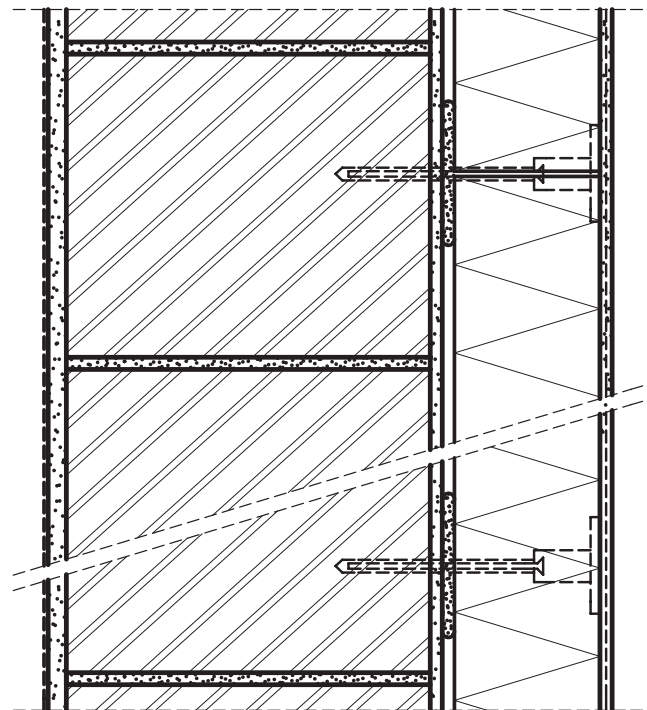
Example detail: an aerated clay masonry wall with an external thermal insulation composite system
